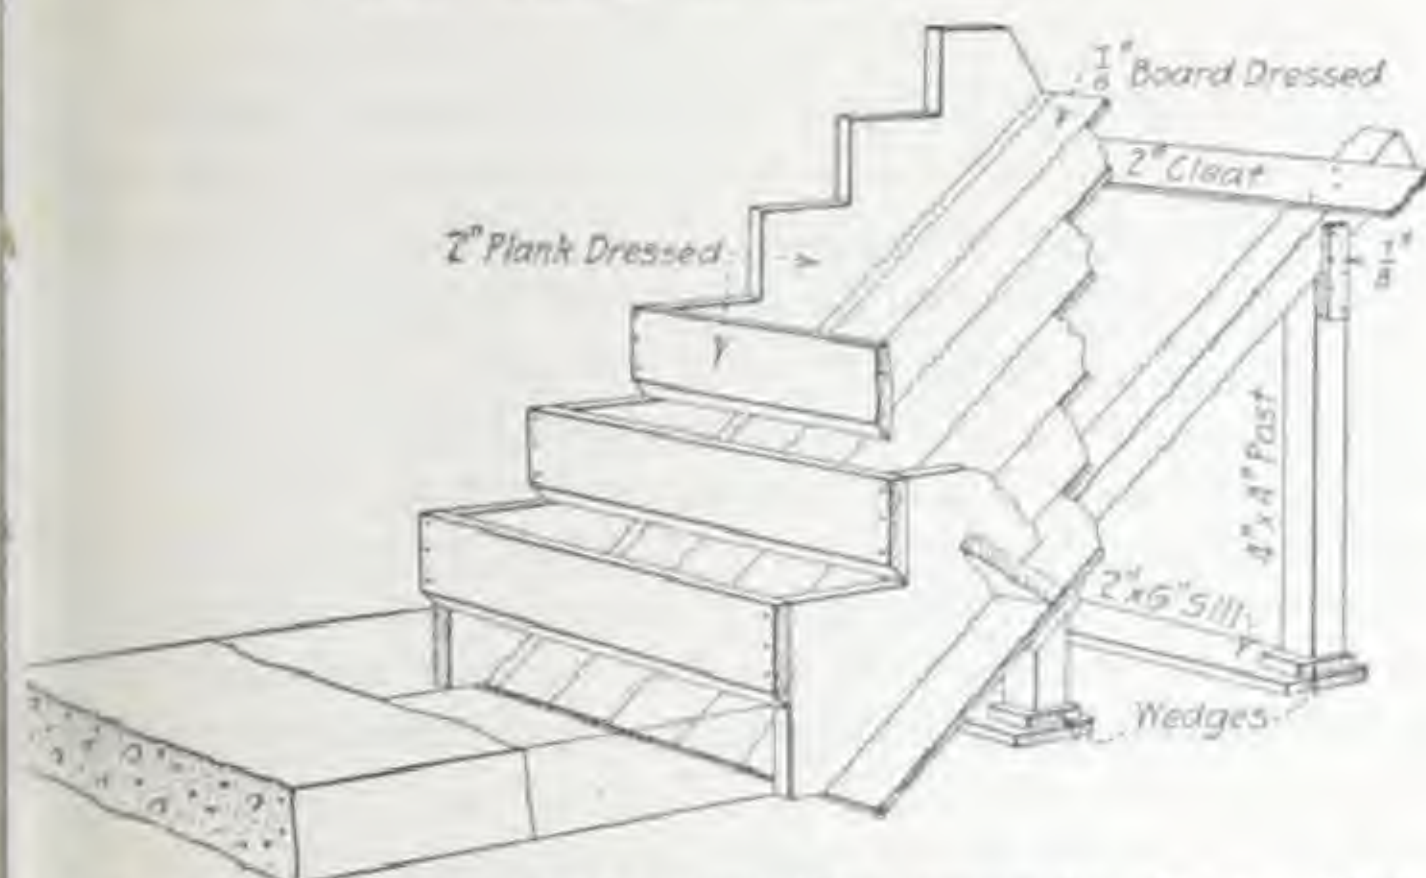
Forms for self-supporting concrete steps. Step slab reinforced as shown in Fig. 42.
